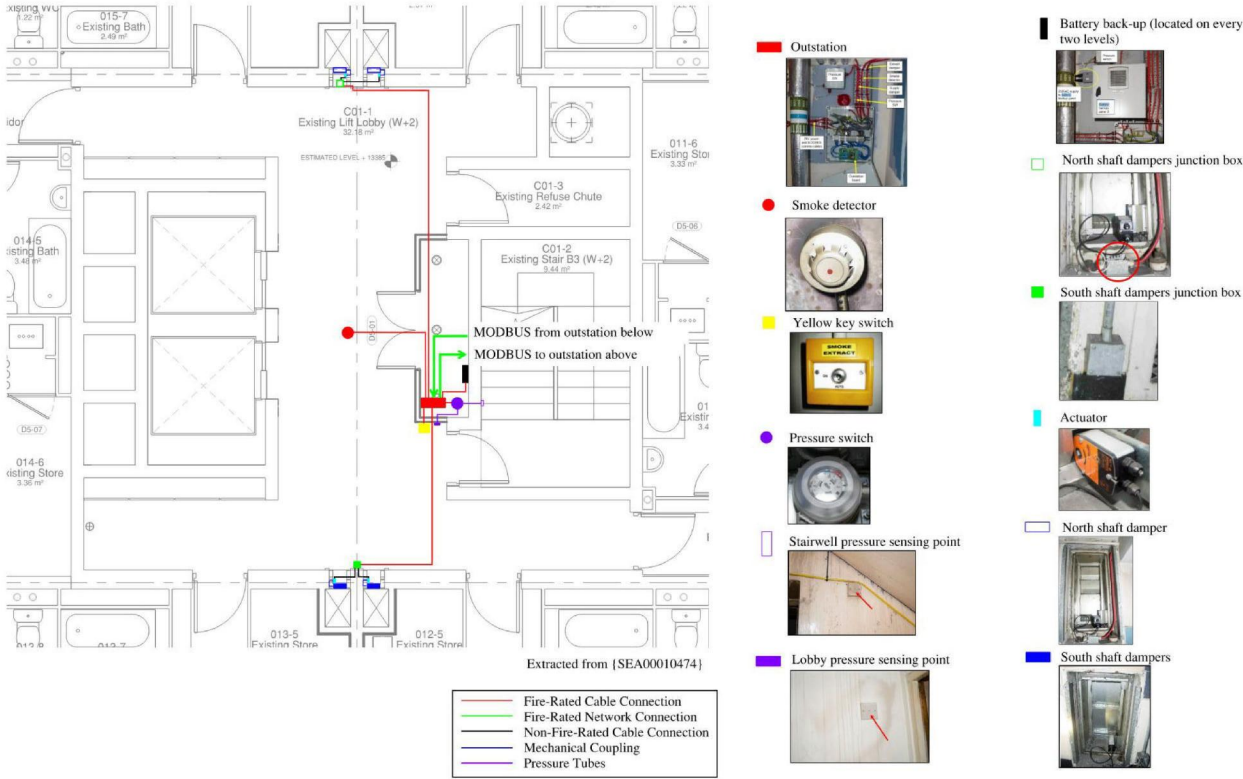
Outstation on a typical floor (Levels 4 to 23) with connected smoke control components.
